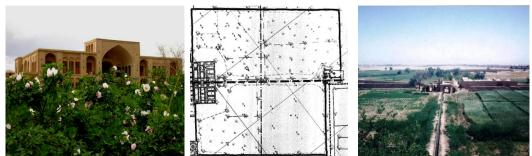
Pavilion after restoration - Garden's plan and view before conservation
